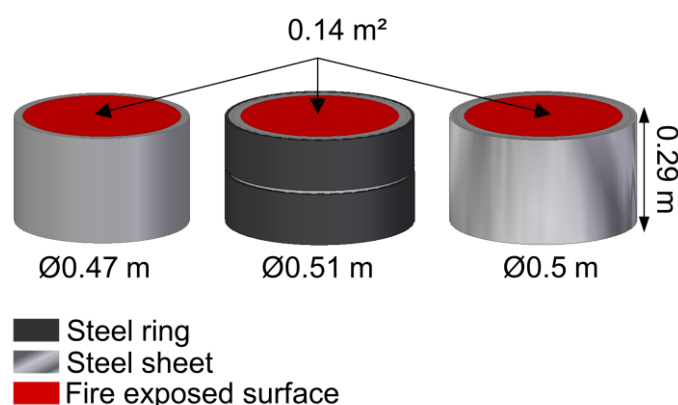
Sketches of the concrete specimens with an unrestrained surface, steel rings and steel sheet restrain
